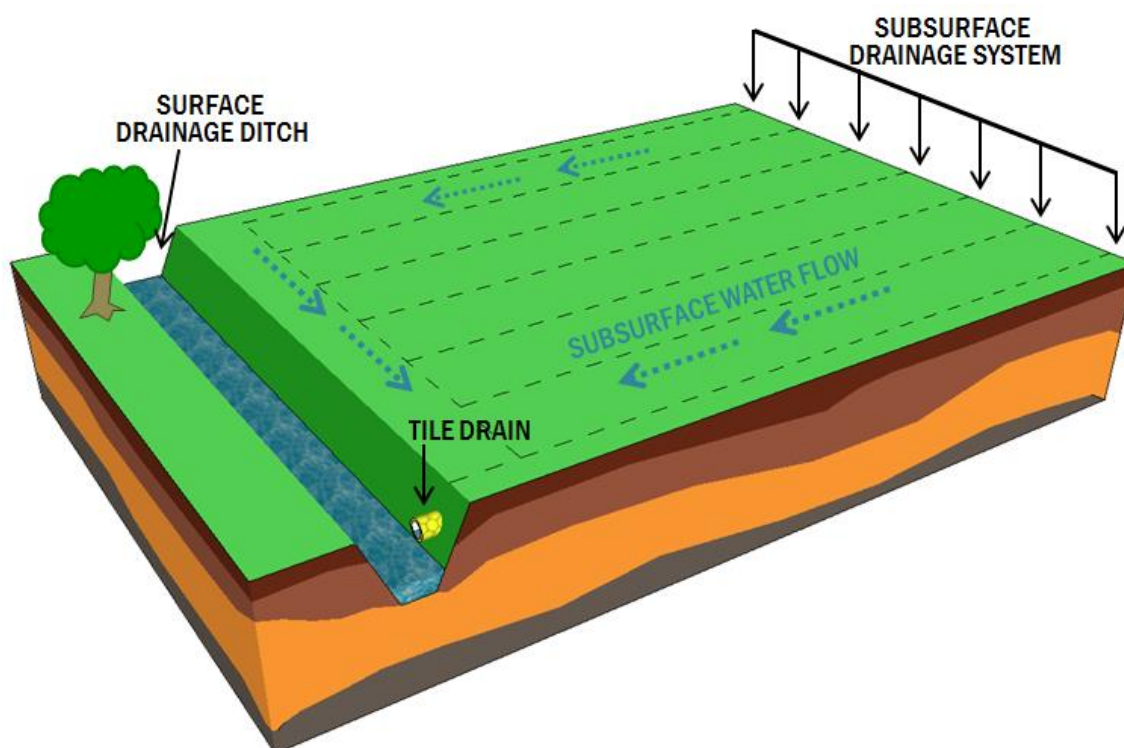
Overview of a typical parallel subsurface tile drain system.
